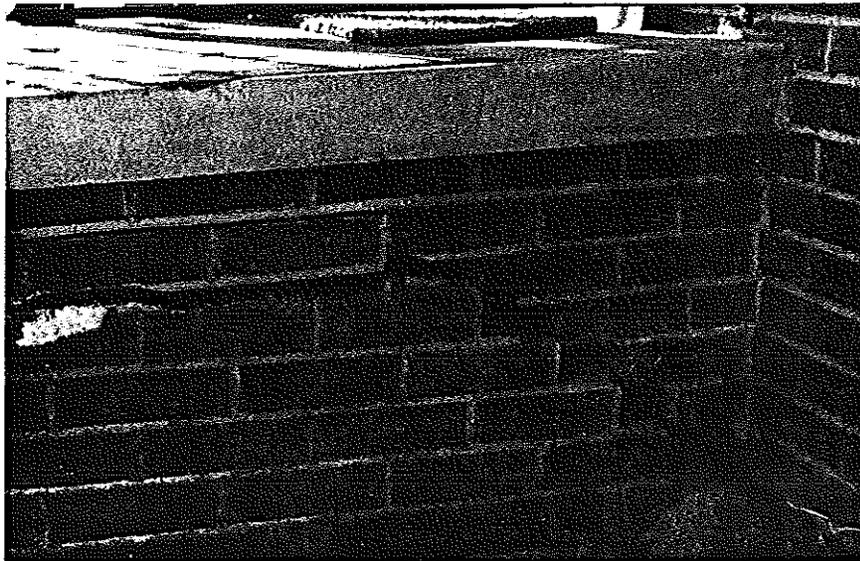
STAIRSTEP CRACKING OF MORTARED JOINTS IN BRICK WALL.
